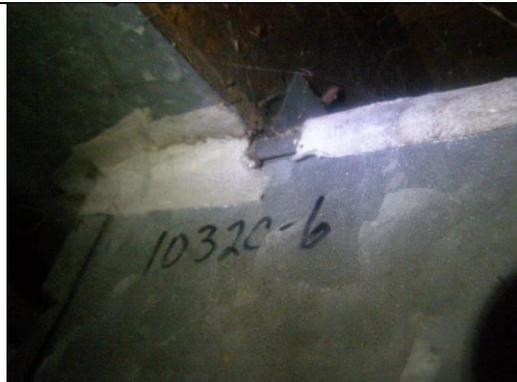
Seam Tape (1032C-6) Basement, Ceiling.
